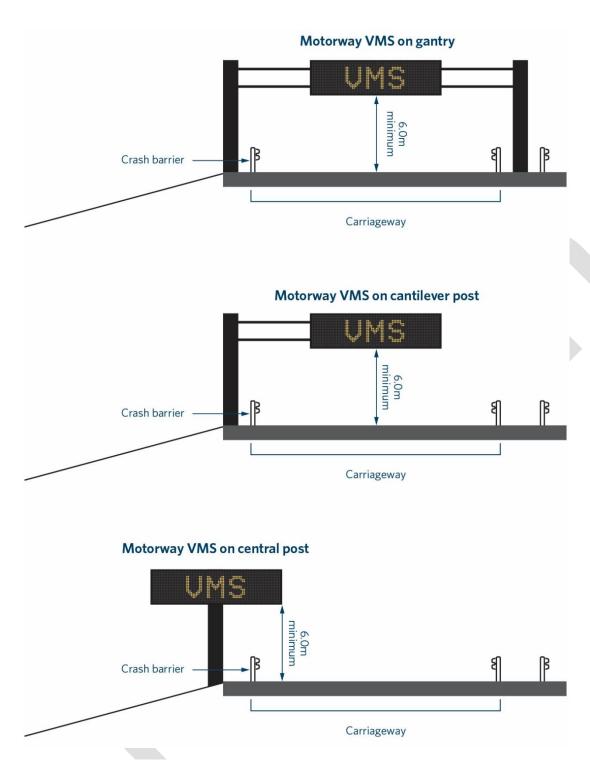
Example of typical cross-sectional view of mounting options for motorway and expressway VMS.
